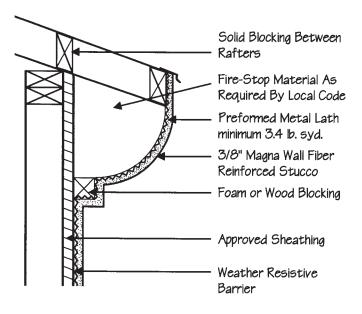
TYPICAL INSTALLATION DETAILS—(Continued)
